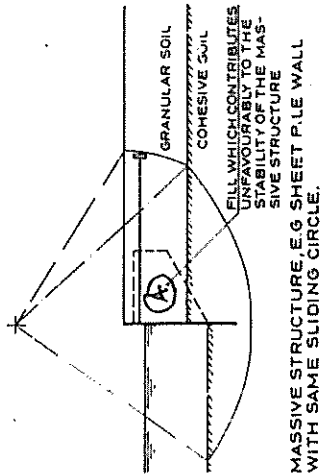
(o) Comparison of Sliding Stability for Open Structure and Massive Structure
